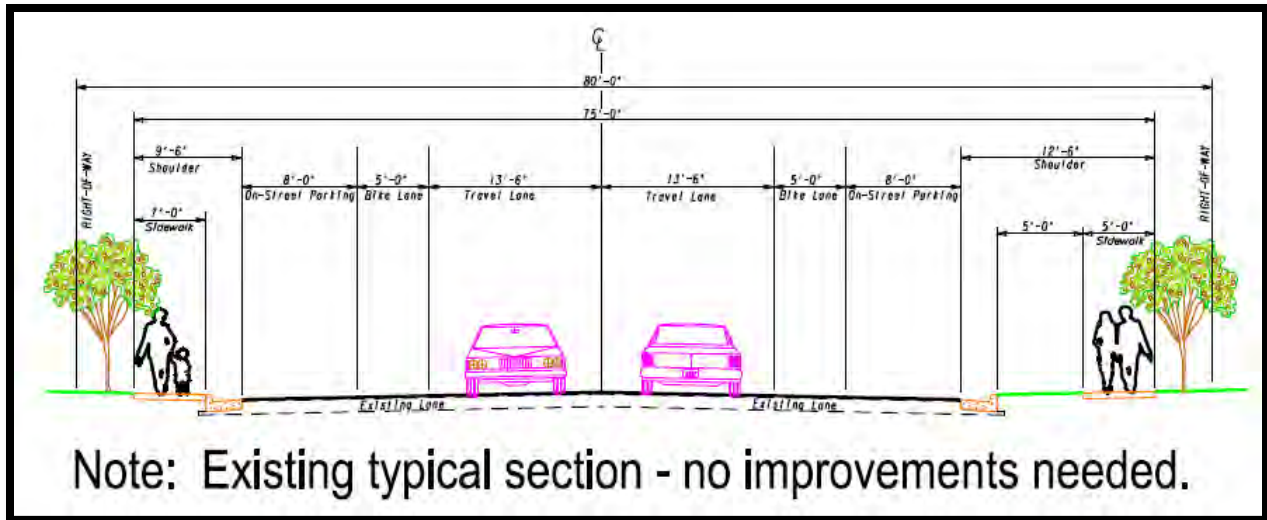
Proposed Typical Section – Alternative 2 – 20th Ave. from West First St. Extension to Georgia Ave.
